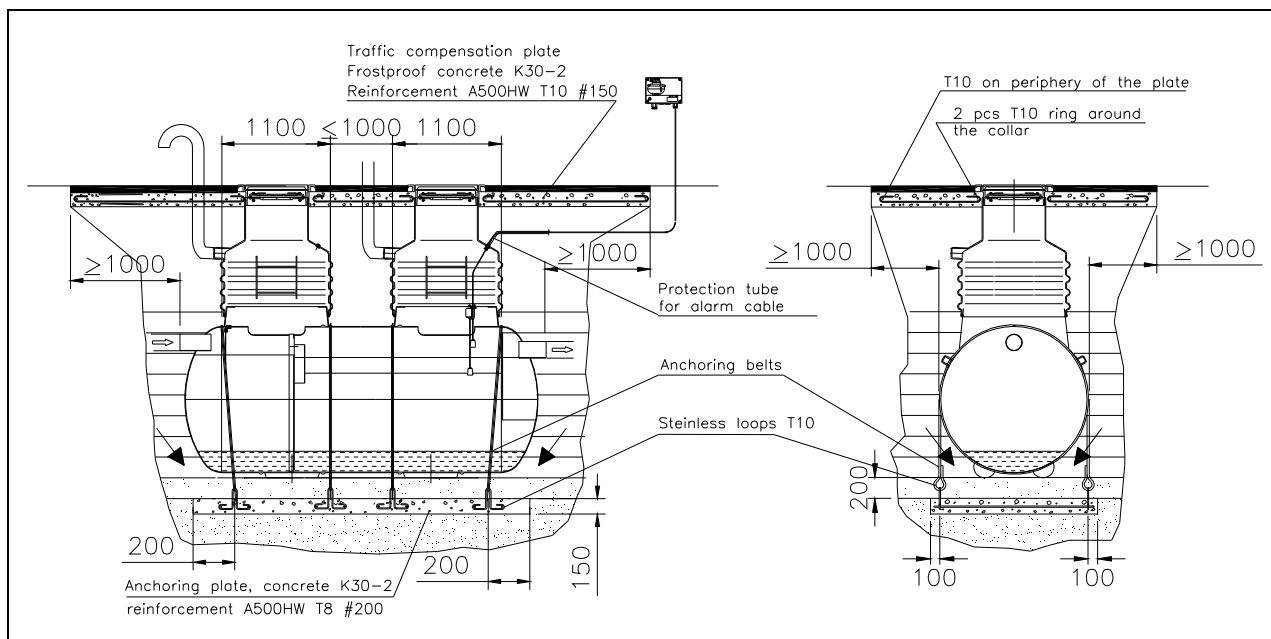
Anchoring the separator on areas with ground-water and on weak grounds.
